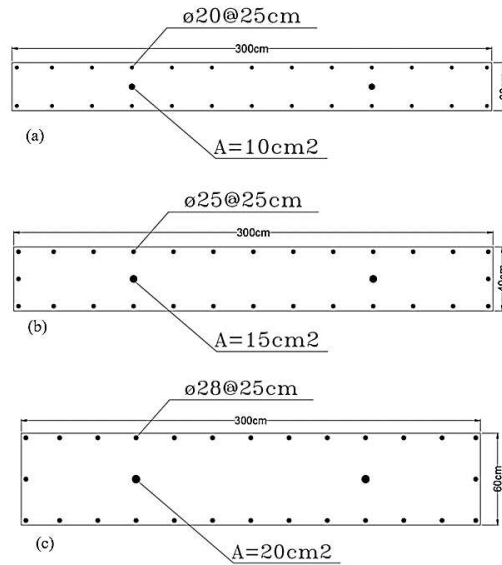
Rocking core configuration of (a) 4-story frame, (b) 8-story frame, and (c) 12-story frame
